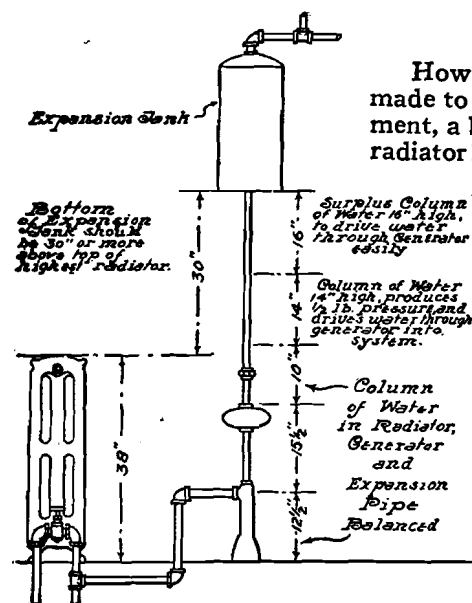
Connections for Generator when Located on a Second or Higher Floor
